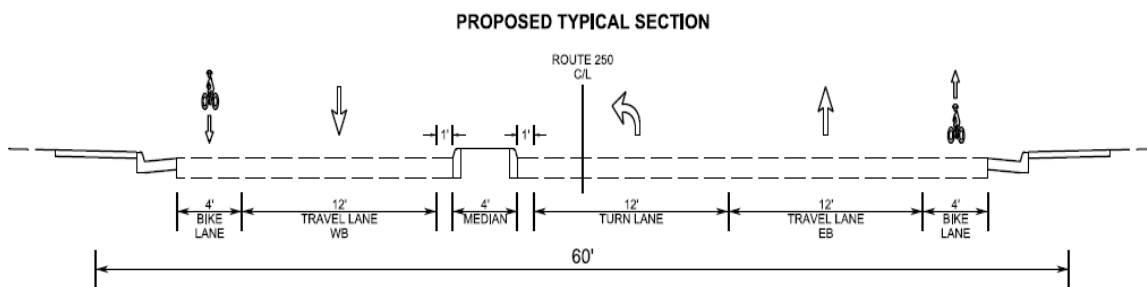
Proposed Typical Section for Combined Road Diet and Access Management Improvements
